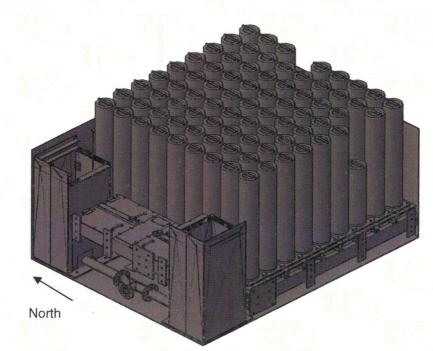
TMI, Unit 1 Top Hat Framing Structure
